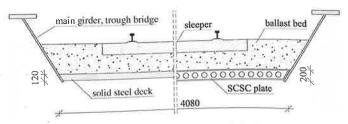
Typical trough bridge section with ballast bed. Comparison of two deck slab systems; left: 120 mm thick solid steel deck slab; right: 200 mm deep SCSC plate. Dims. in mm. Institute of Structural Engineering, TU Wien [1]
